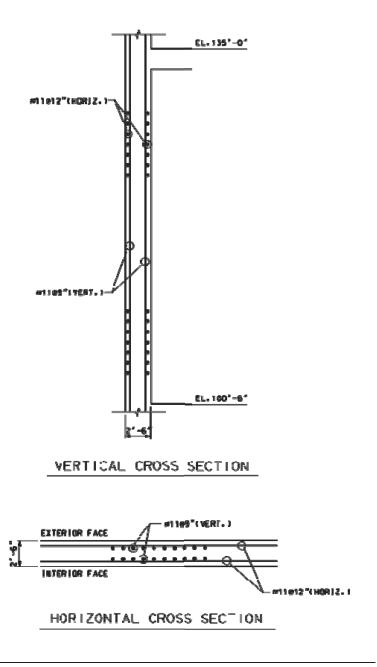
A-55 Reinforcement Arrangement of Center Wall of the EDG Building
